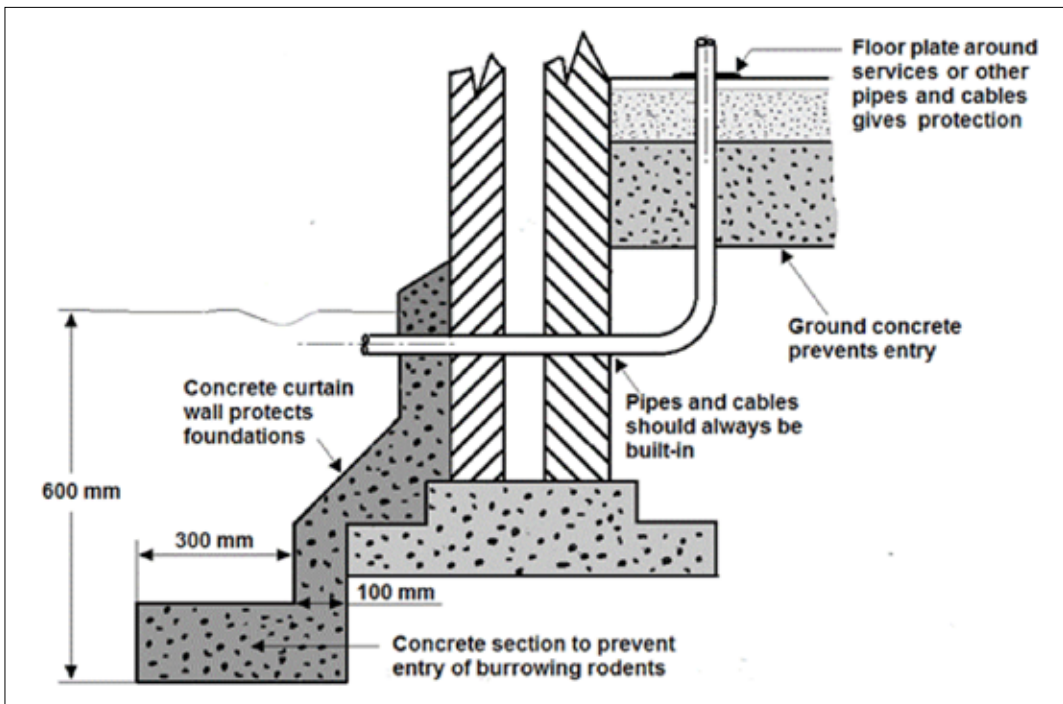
Protecting the building from pests can be done using concrete-filled, L-shaped foundation at least 600 mm below the ground level (EHEDG, 2014).
